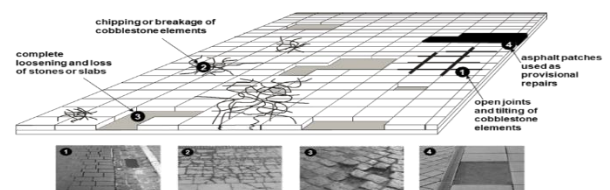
Types of surface damage in pavement structures made of cobblestones and slabs Source: Hoffmann, 2013 (edited by author)
